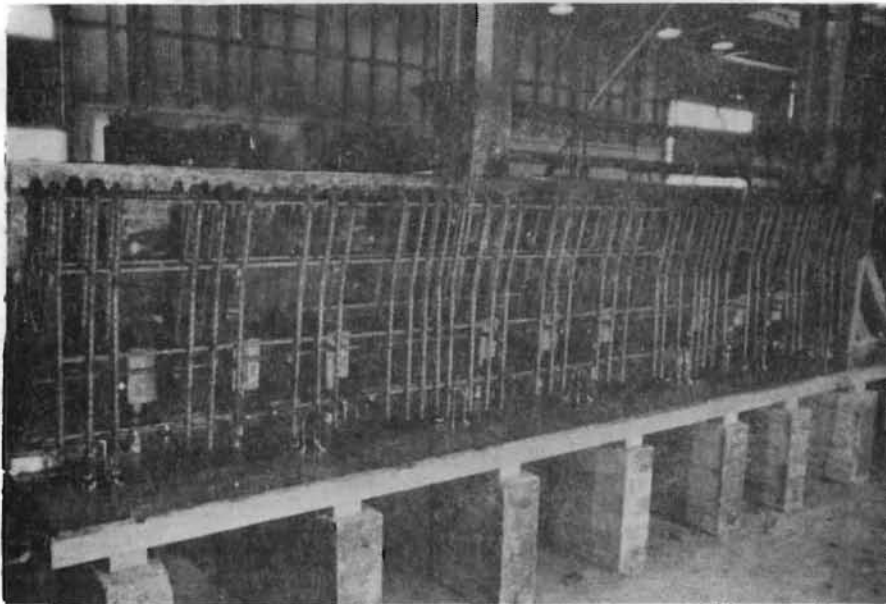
Cast-in place barrier forms after placement of reinforcing cage
